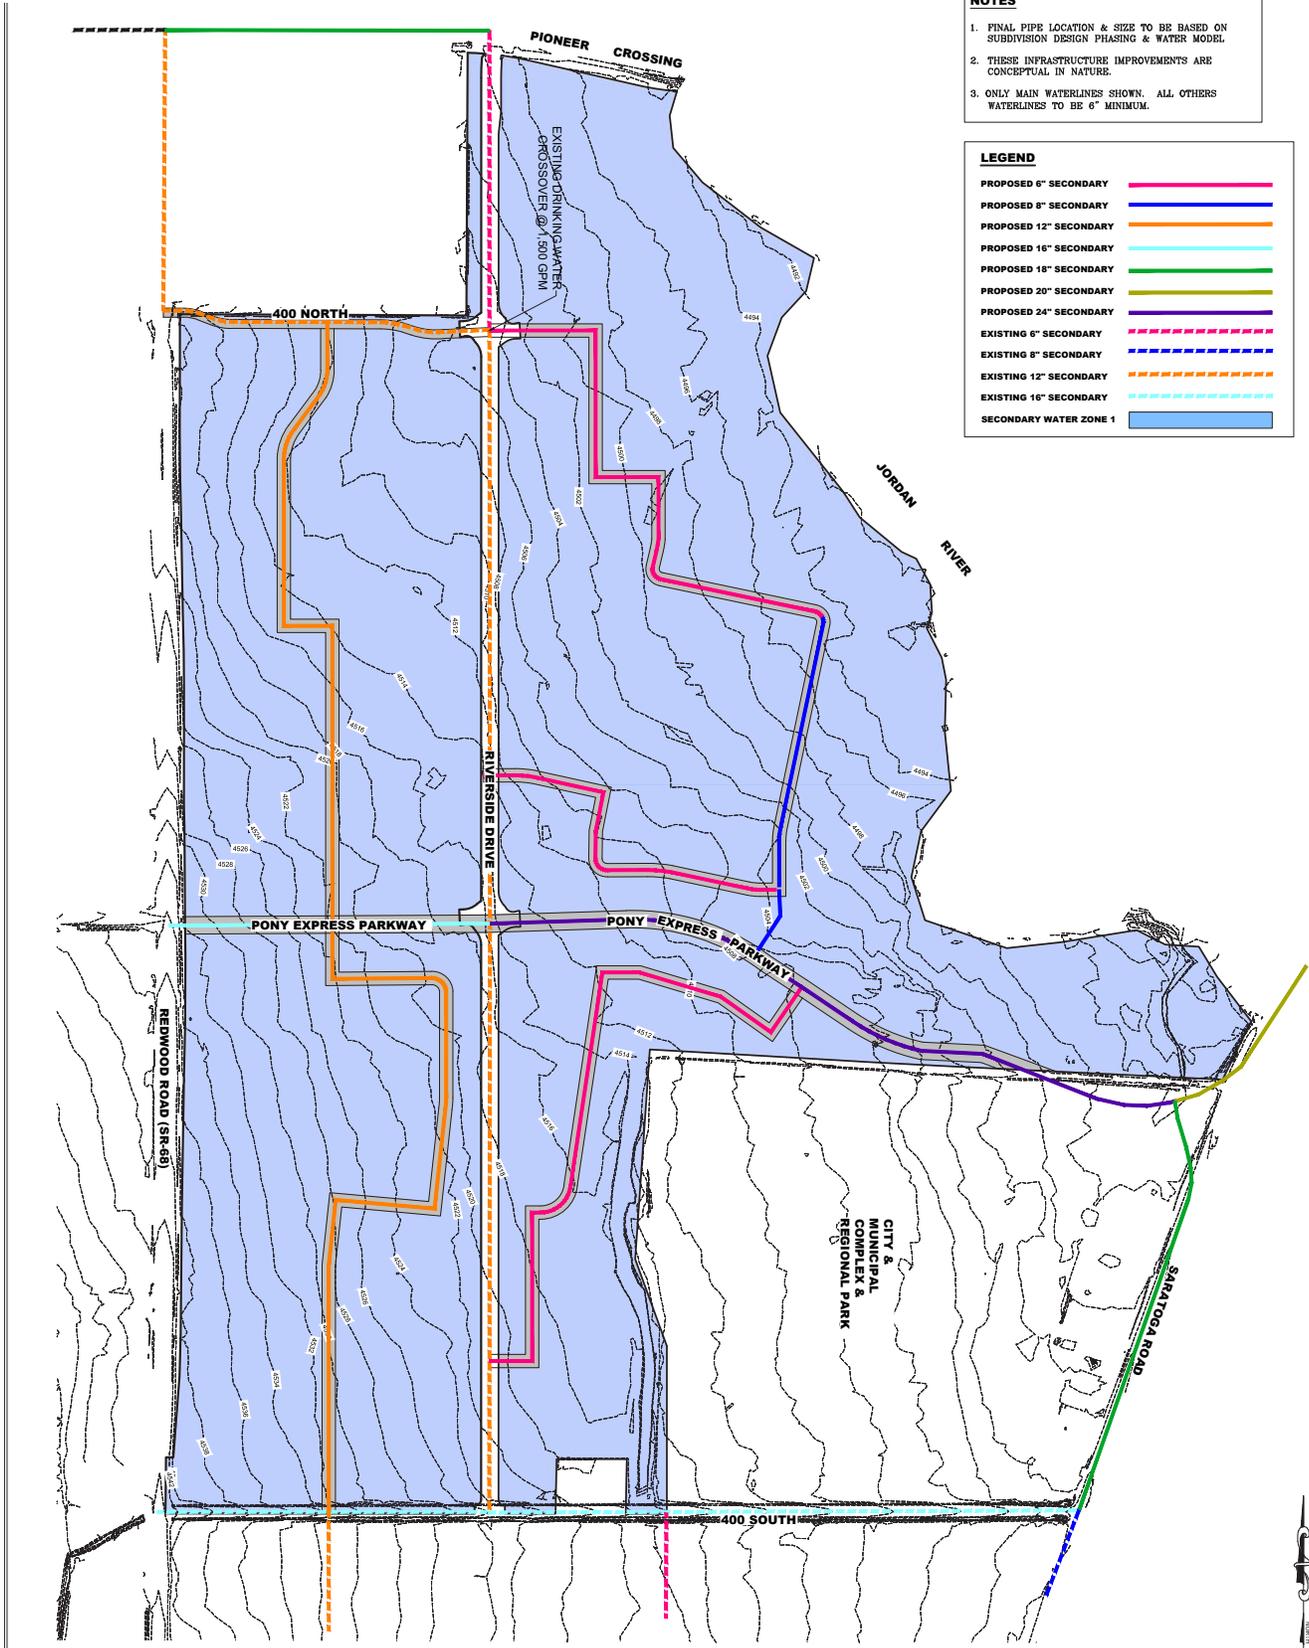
SECONDARY WATER MASTER PLAN
